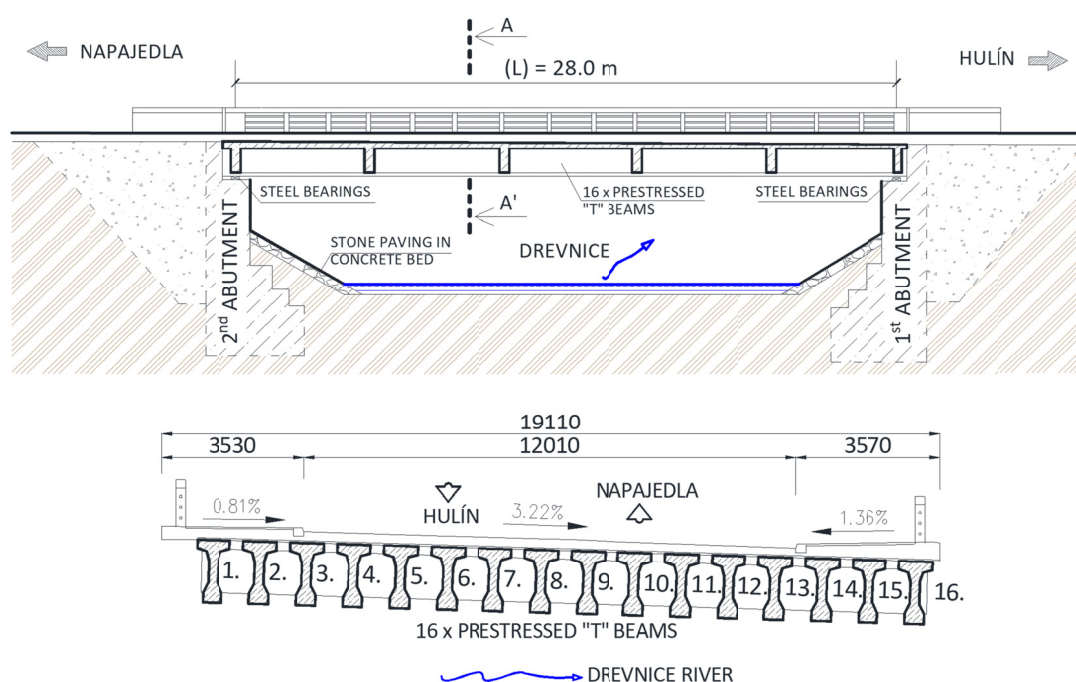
The longitudinal and cross (A-A') sections of the bridge 55I-030
